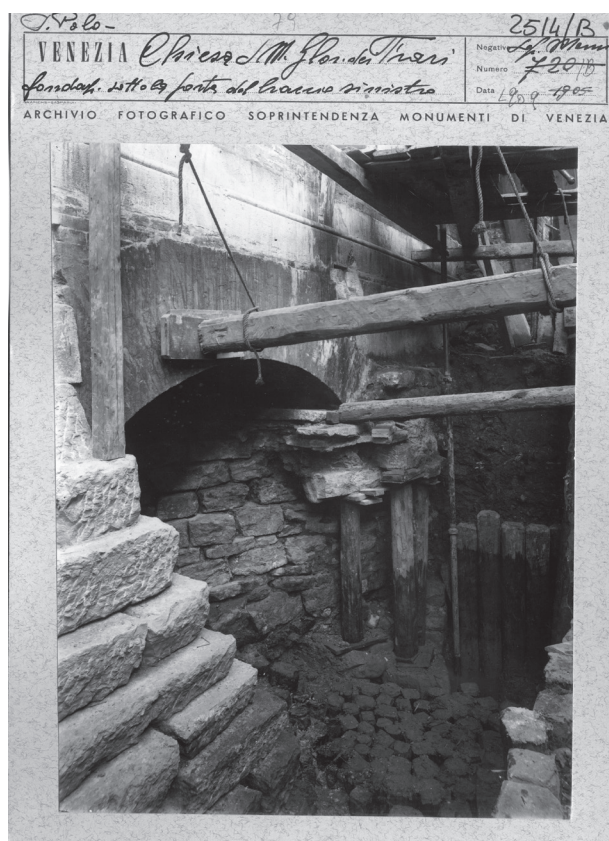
Picture of the strengthening intervention on the bell tower foundations, dated back 1904 (Photo archive of the “Soprintendenza per i beni architettonici e paesaggistici di Venezia e laguna”).
